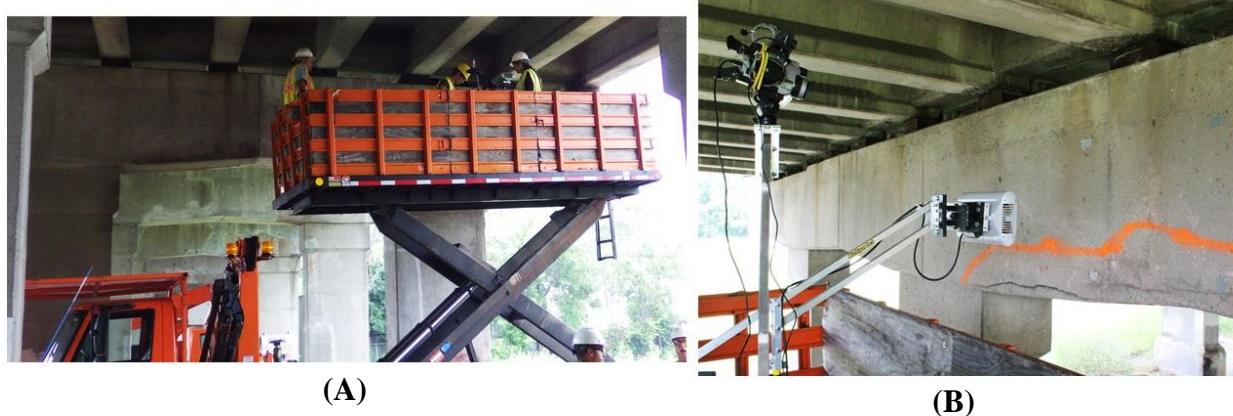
(A) Platform Lift Truck (B) Active IR Thermography Test Set-Up for a Franklin Street Bridge Pier Cap.
